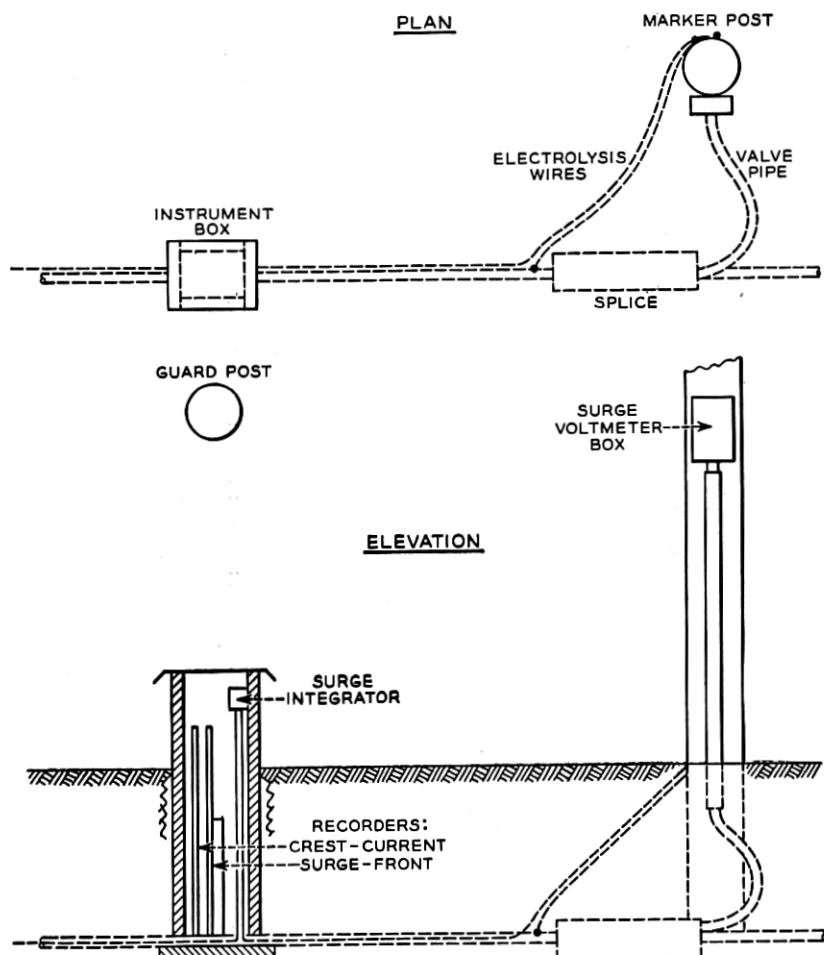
Typical instrument arrangement at splice points about 2300 feet apart.
